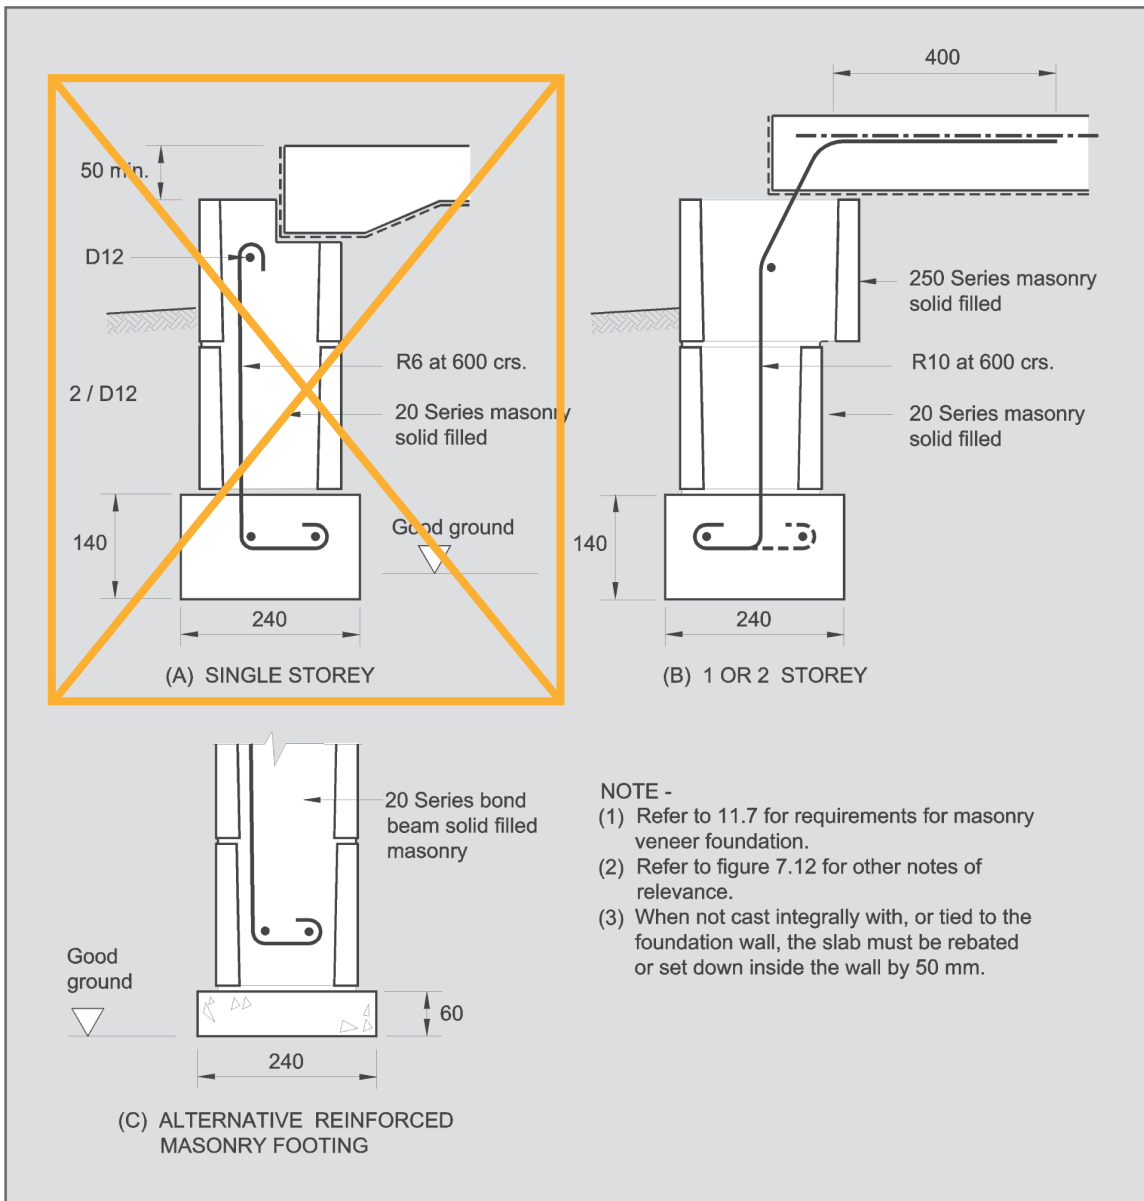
Masonry veneer foundation edge details – Concrete masonry (see 7.5.2.3 and 11.7)
